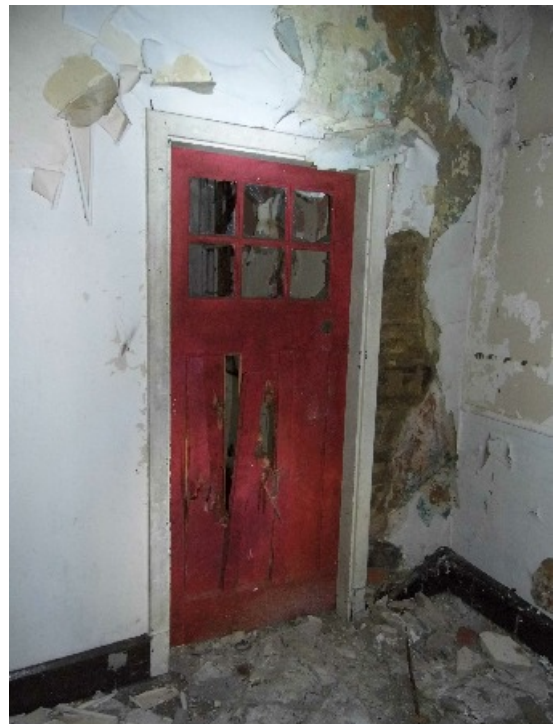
The Assembly Room (Area 6) looking north (frame BOS14031)
